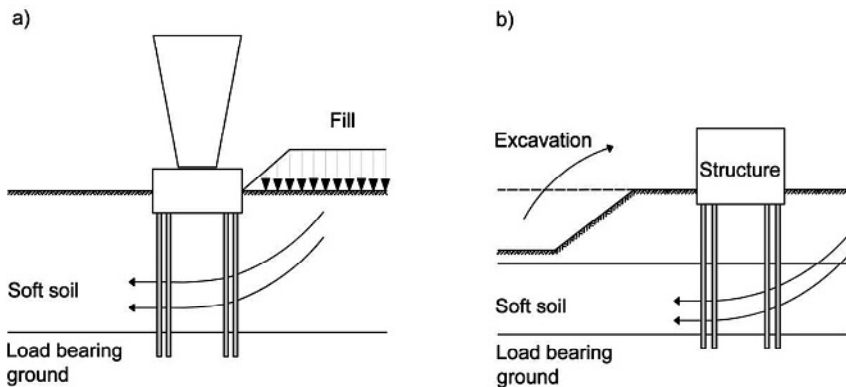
Examples of the causes of lateral pressure on piles; a) resulting from fills, b) resulting from excavations, from [59]
